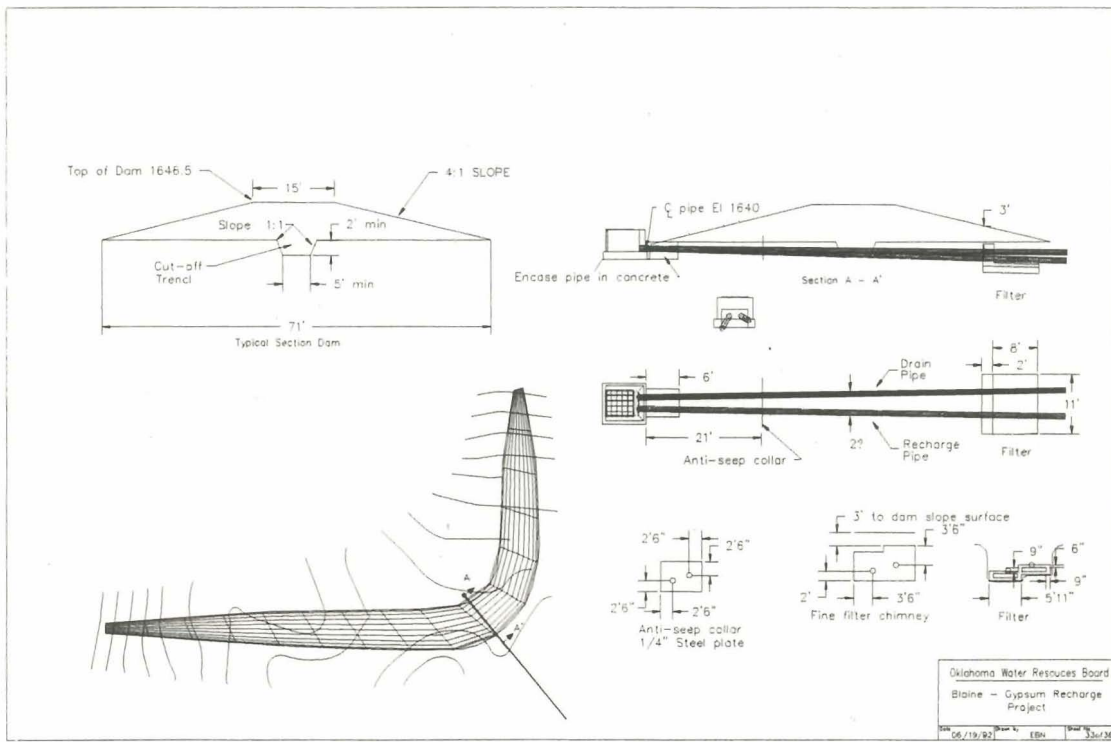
Schematic cross-section of dam at the Conservation Dam Site showing discharge pipes.
